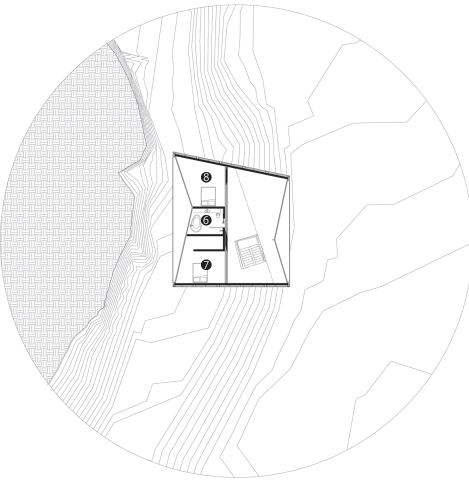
House 4 plans, Scale: 1:400 at A4 1:200 at A2
